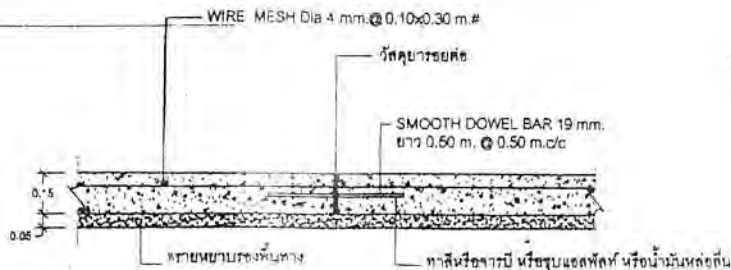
DETAIL. CONSTRUCTION JOINT (รอยต่อเพื่อการก่อสร้าง)
